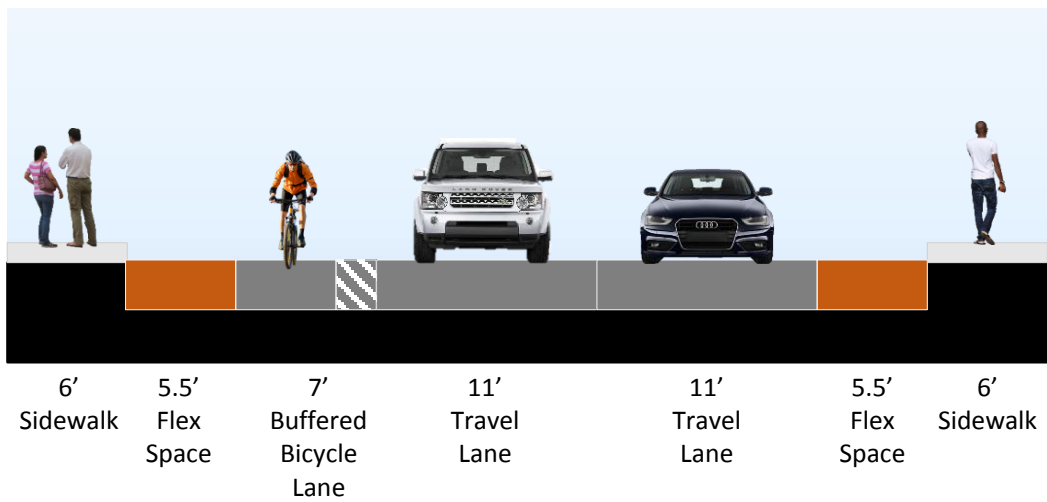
Tampa Street/Highland Avenue Alternative 1 Typical Cross-Section
